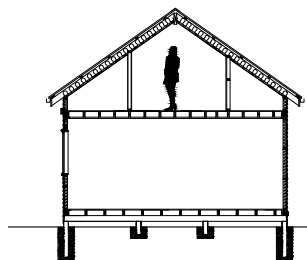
Attic truss roof space is habitable. Drawn by the author.
